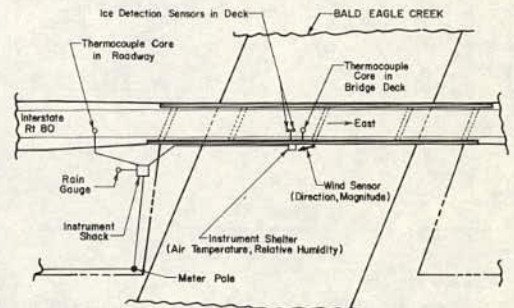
Plan view of instrumented bridge deck showing sensor locations.
